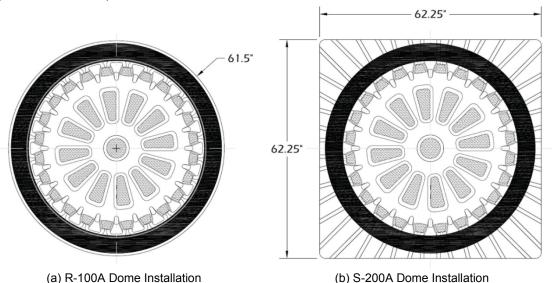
Silt-Saver Footprint on Typical Inlet Structure.
